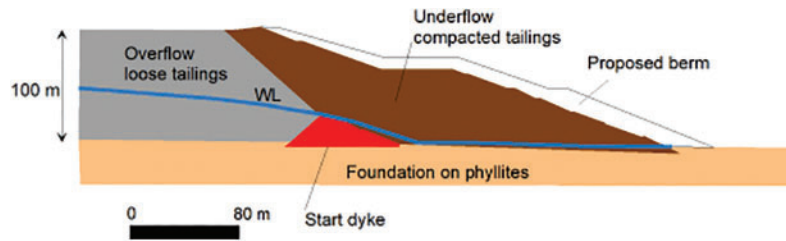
Cross-section and proposed berm, Dam No. 3.
